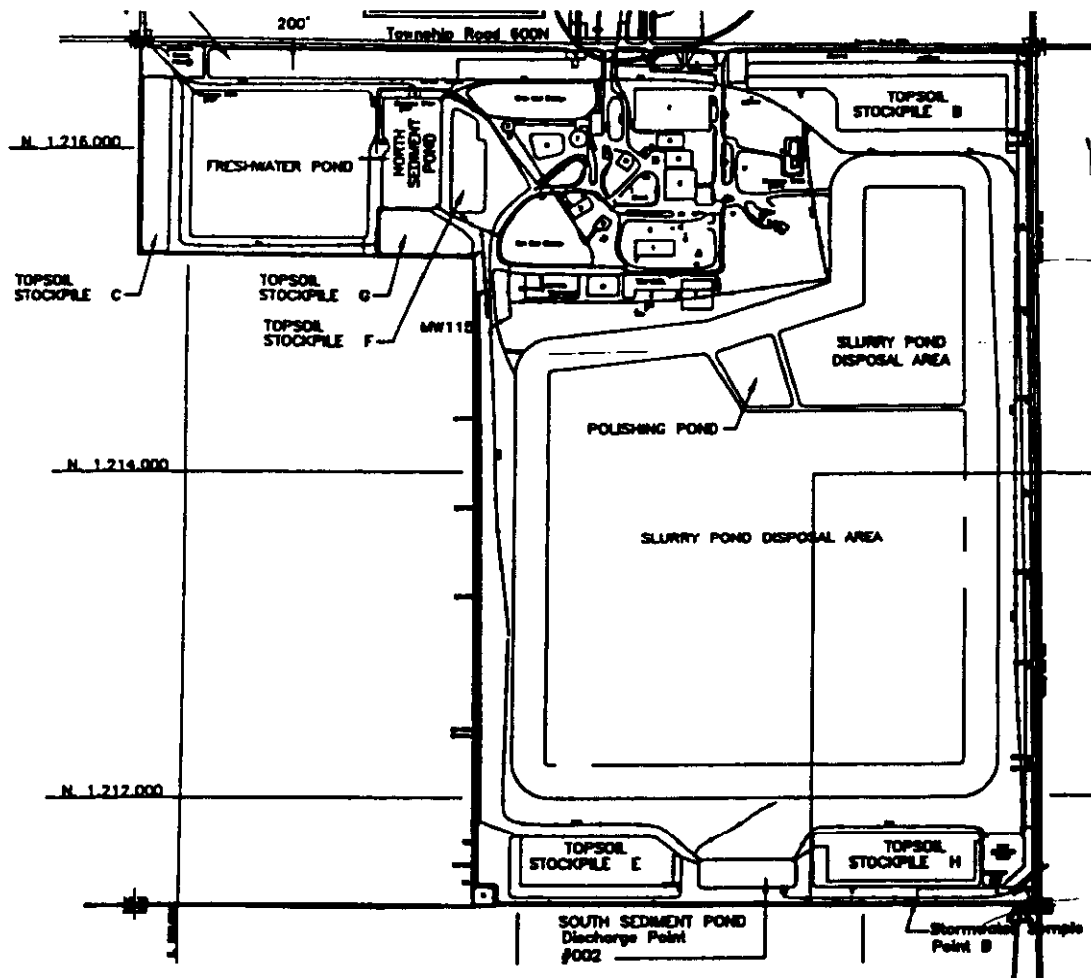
Layout of existing ponds on Turriss Coal Company property
